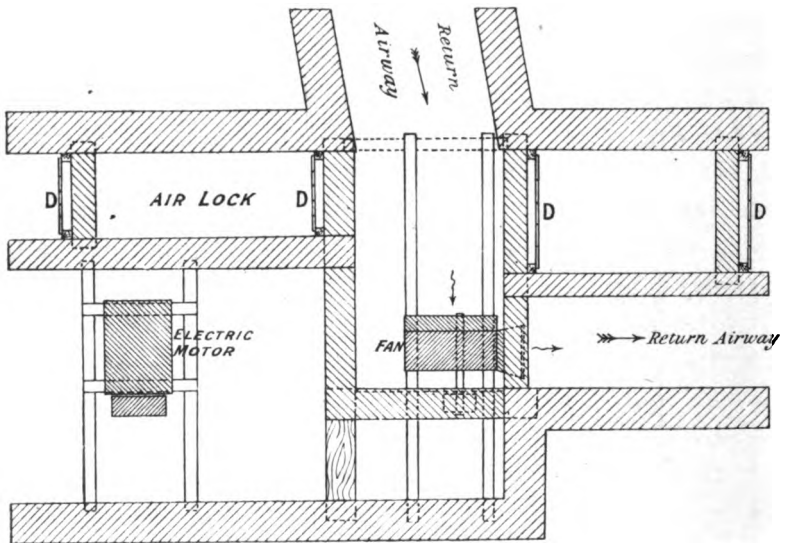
Arrangement of a Sirocco Fan Underground in the Return Air-way as an Auxiliary Ventilator, Florence Colliery, Staffordshire.
